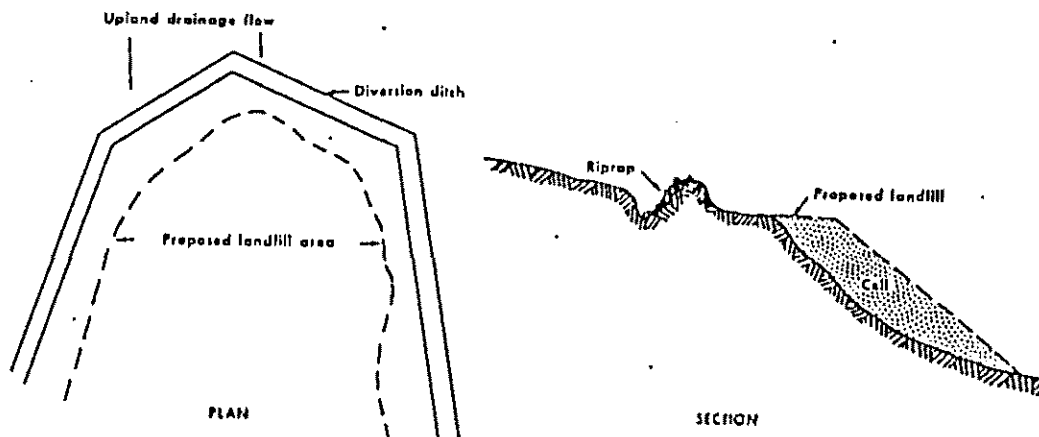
Plan and section views of the use of a diversion ditch to transmit upland drainage around a sanitary landfill.
